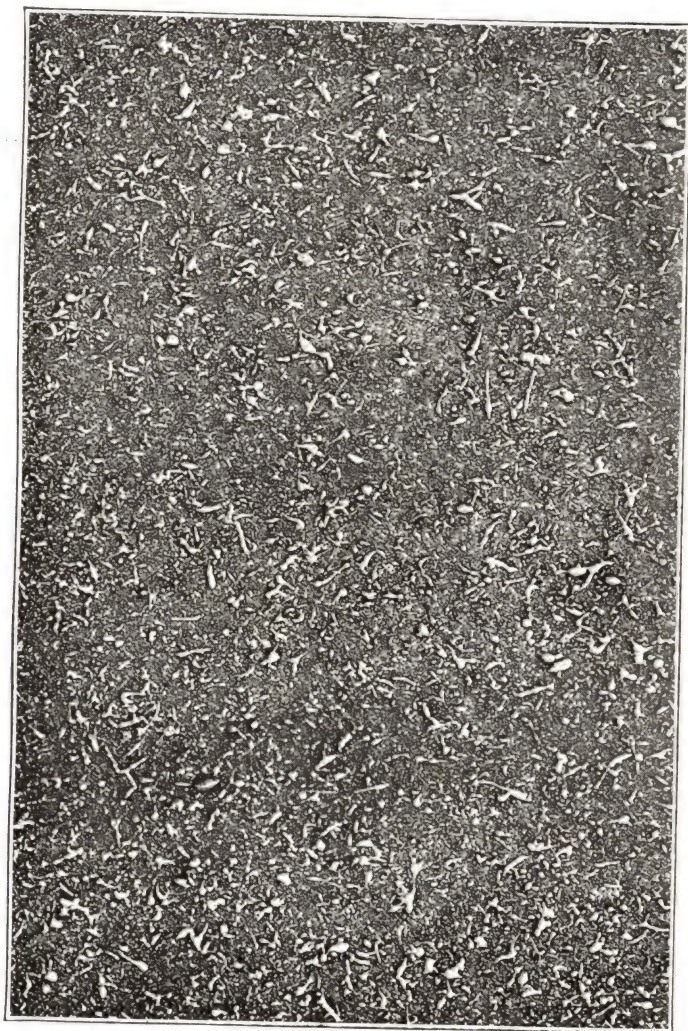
D.—A Finish Similar to That Shown on Plate 77C but with a Finer Texture.
